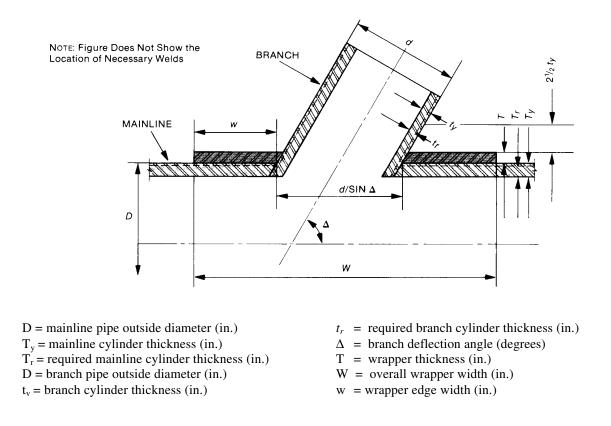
Reinforcement of openings in welded steel pipe
